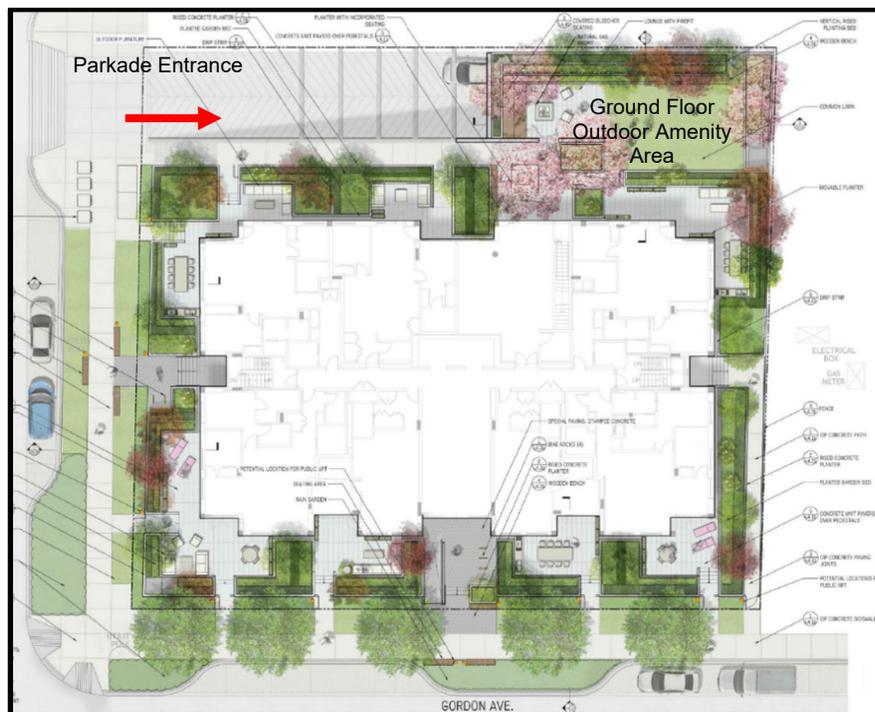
Site Plan for Parcel B (Darwin Properties)
